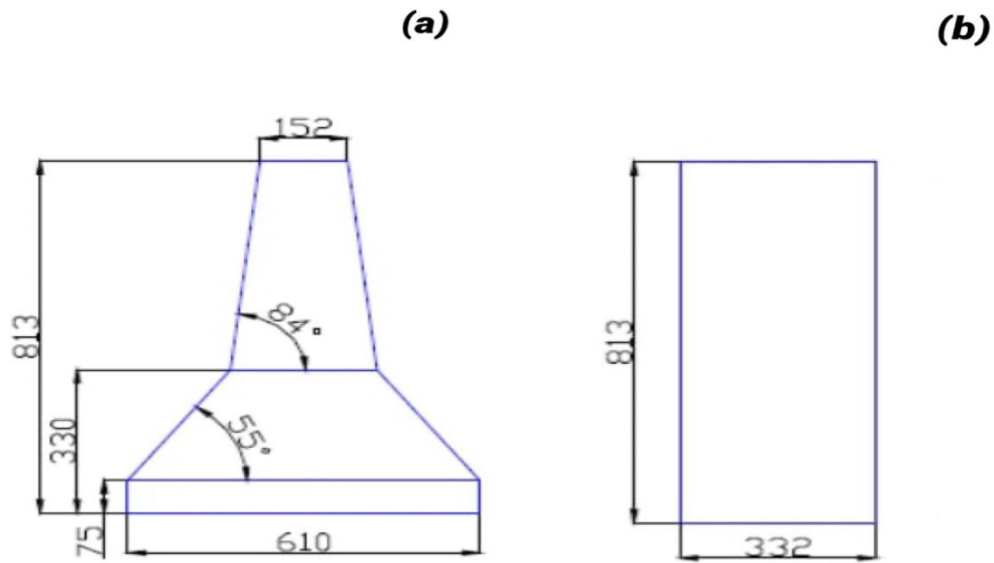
a) New jersey concrete barrier, b) Vertical concrete barrier [114].
